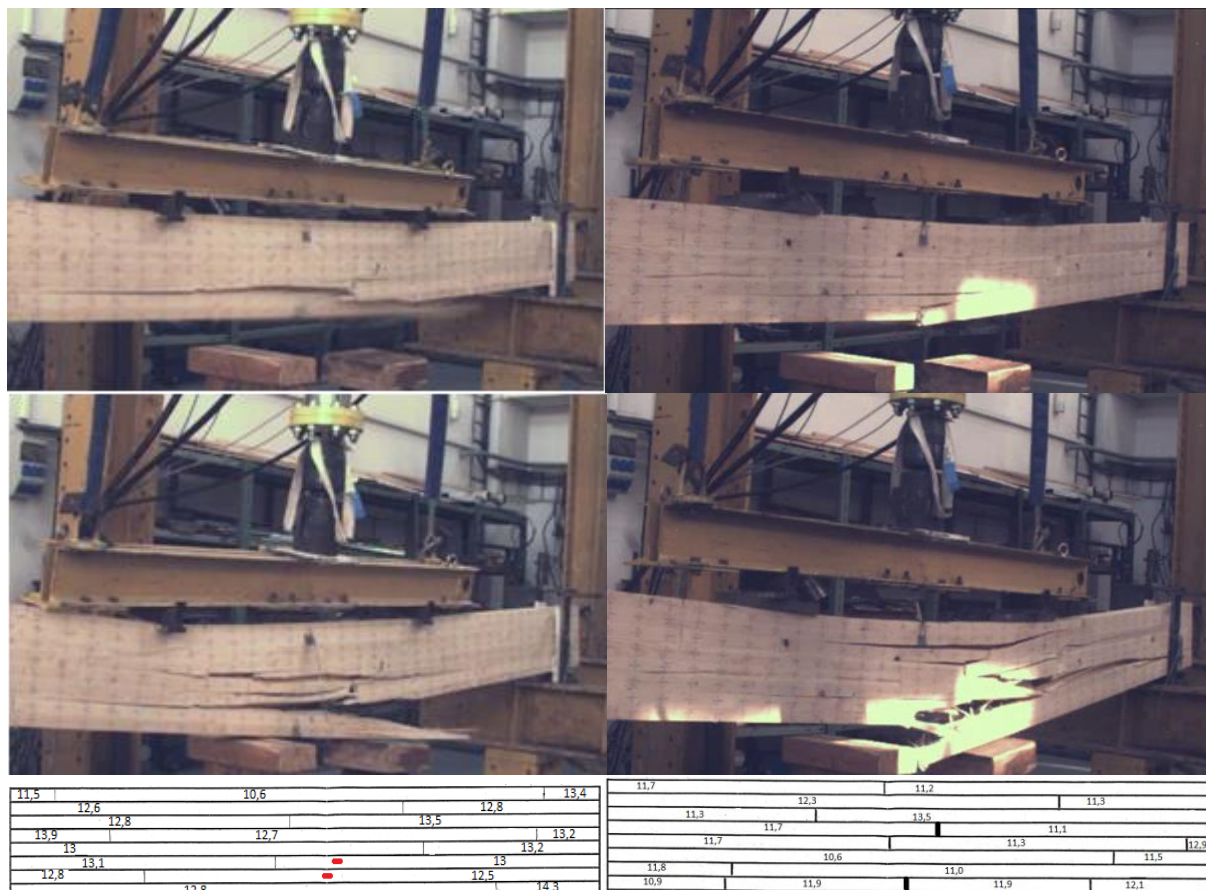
Final collapse of the first beam at the load of 68kN and final collapse of the 2nd beam at the load of 88kN
